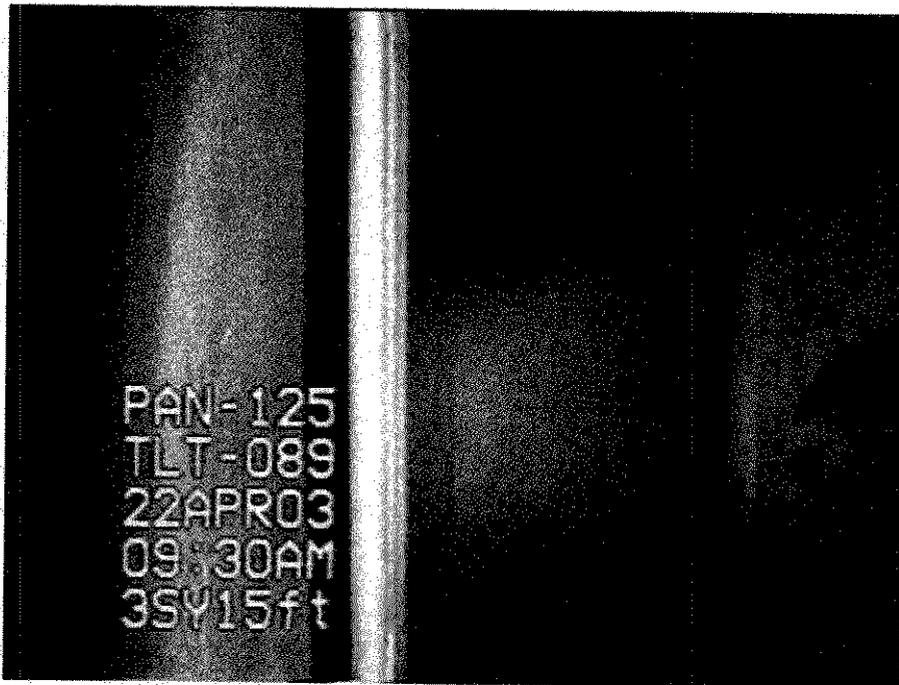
SY-103 Riser 40, Secondary Tank Wall (Left, 2003)
